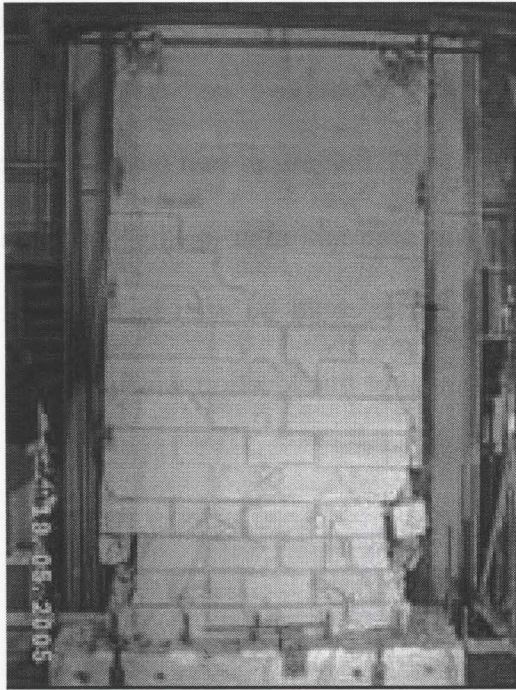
59: Deformation at 80 mm top wall deflection (Wall 5)
